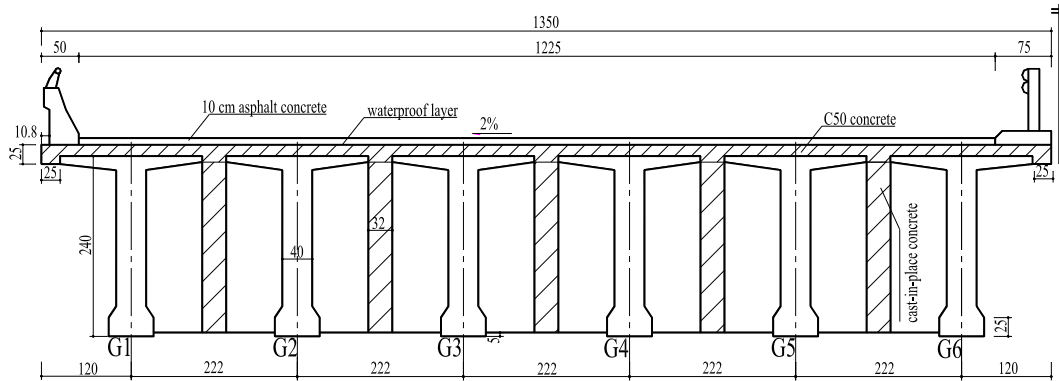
Configuration of the bridge in the mid-span section (units: cm)
